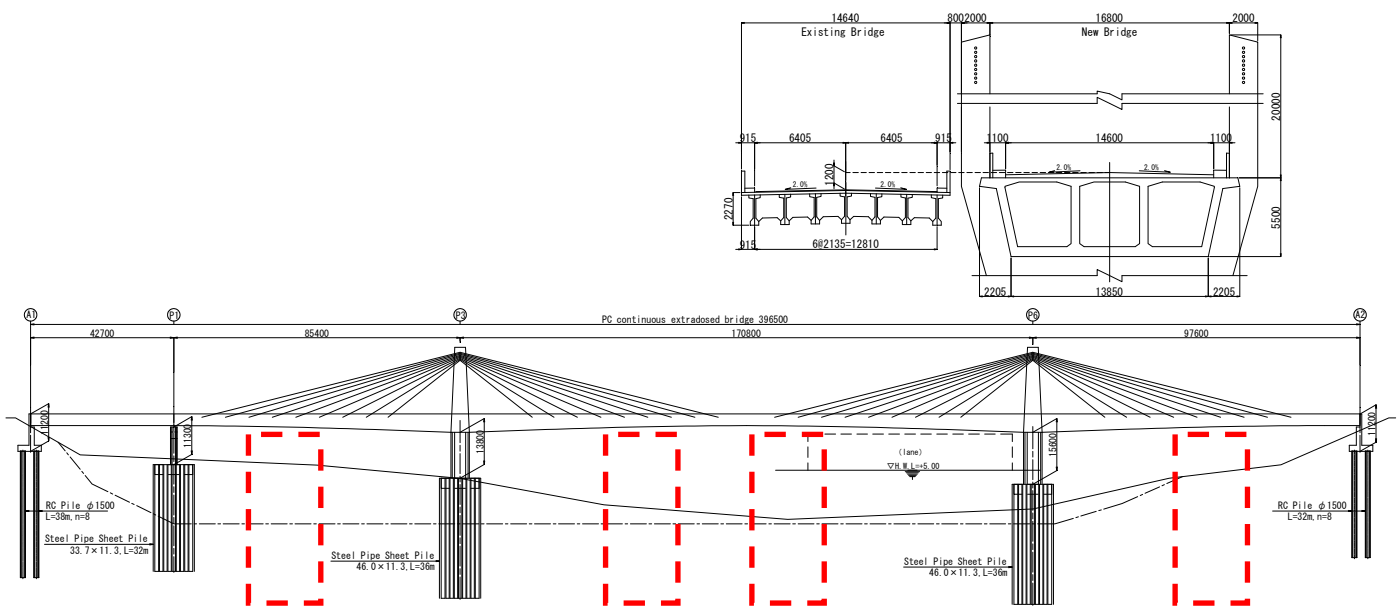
Cross-Section and Side View of Option-4 (Kanchpur Bridge)
